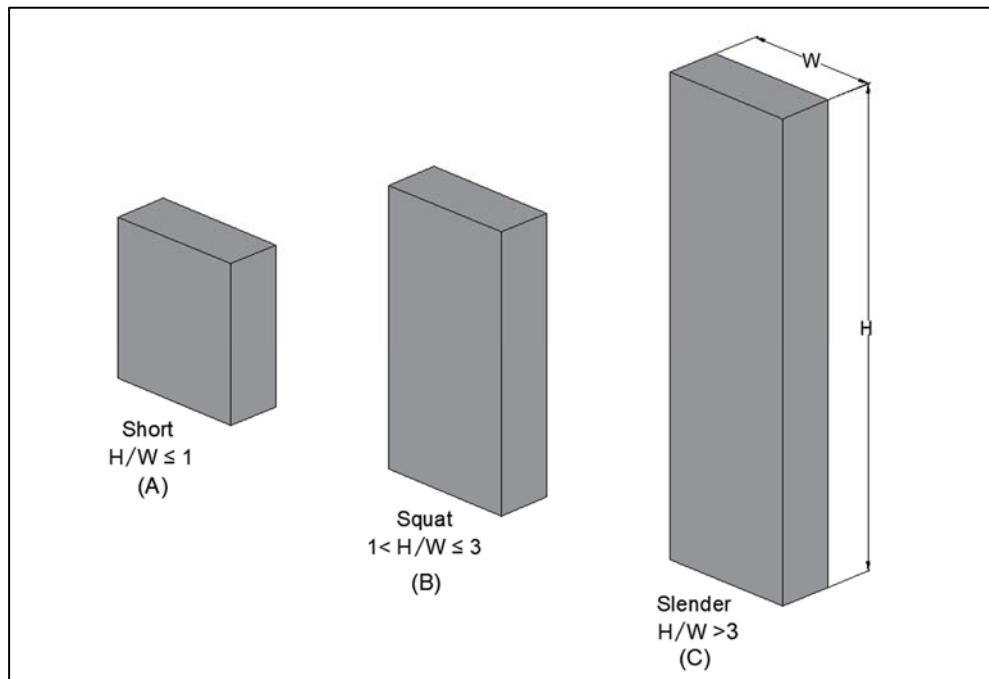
Shear wall classification according to aspect ratio (A) short shear wall, (B) squat shear wall, (C) slender shear wall.
